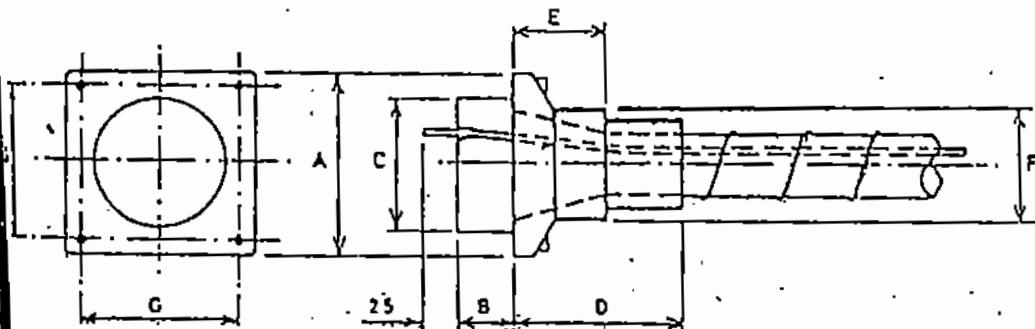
TYPICAL REINFORCEMENT DETAILS AT INTERNAL DEAD END ANCHORAGE
